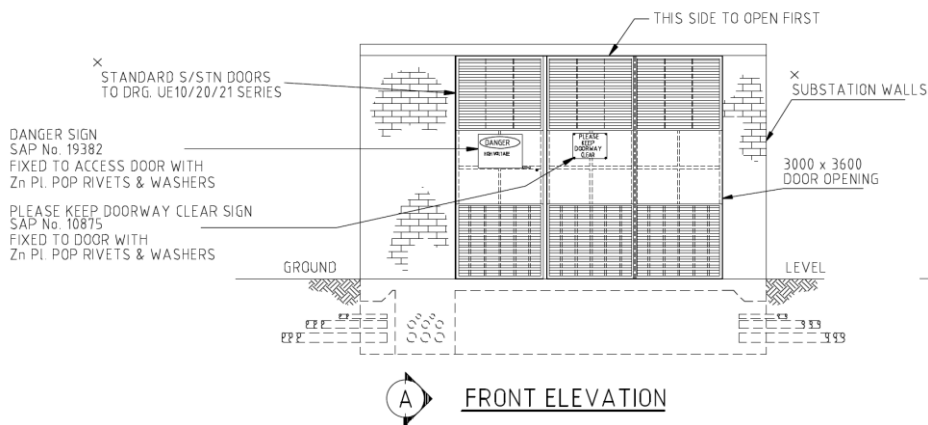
UE SUBSTATION FRONT ELEVATION
